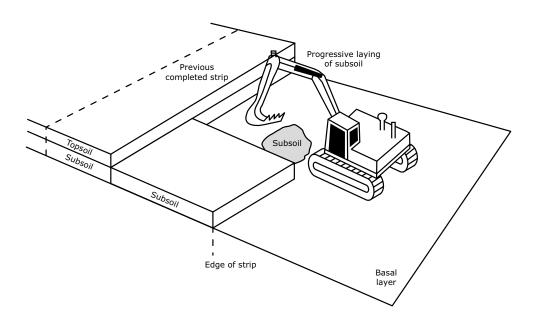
Soil replacement with excavators and dump trucks: Subsoil progressively laid.
